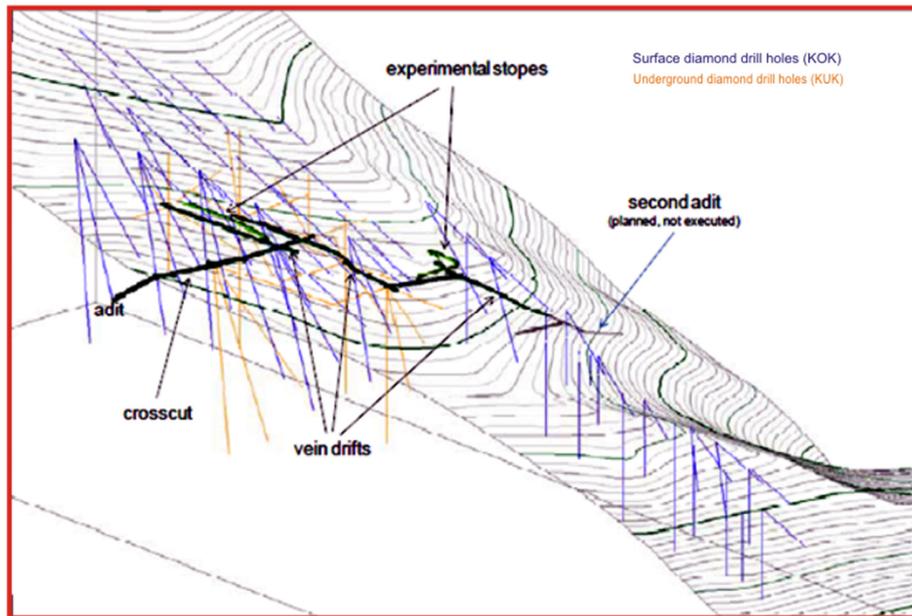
Oblique View showing Diamond drilling and Underground Development.
